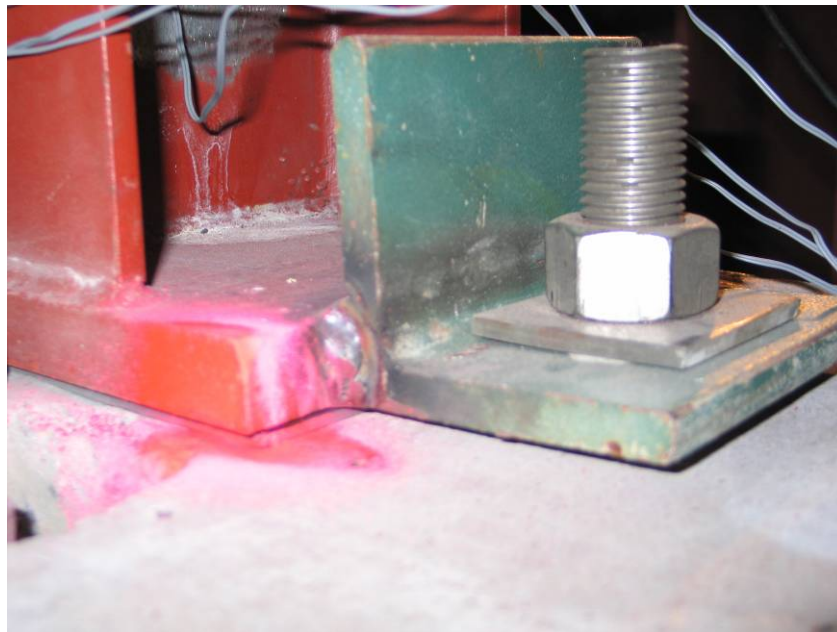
L-shaped angles welded to the base plate of the pedestals
